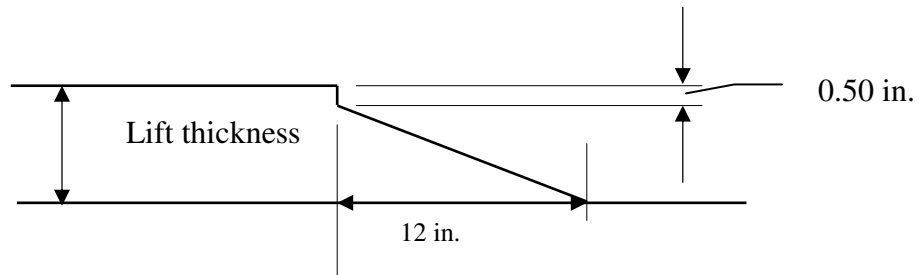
Notched Wedge Longitudinal Construction Joint
